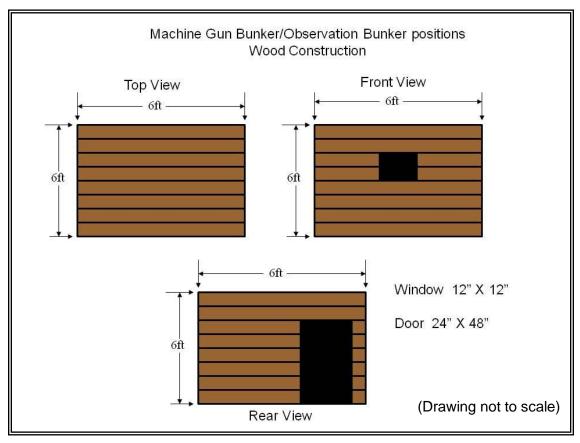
Representative Machine Gun / Observation Bunker Elevation Drawing
